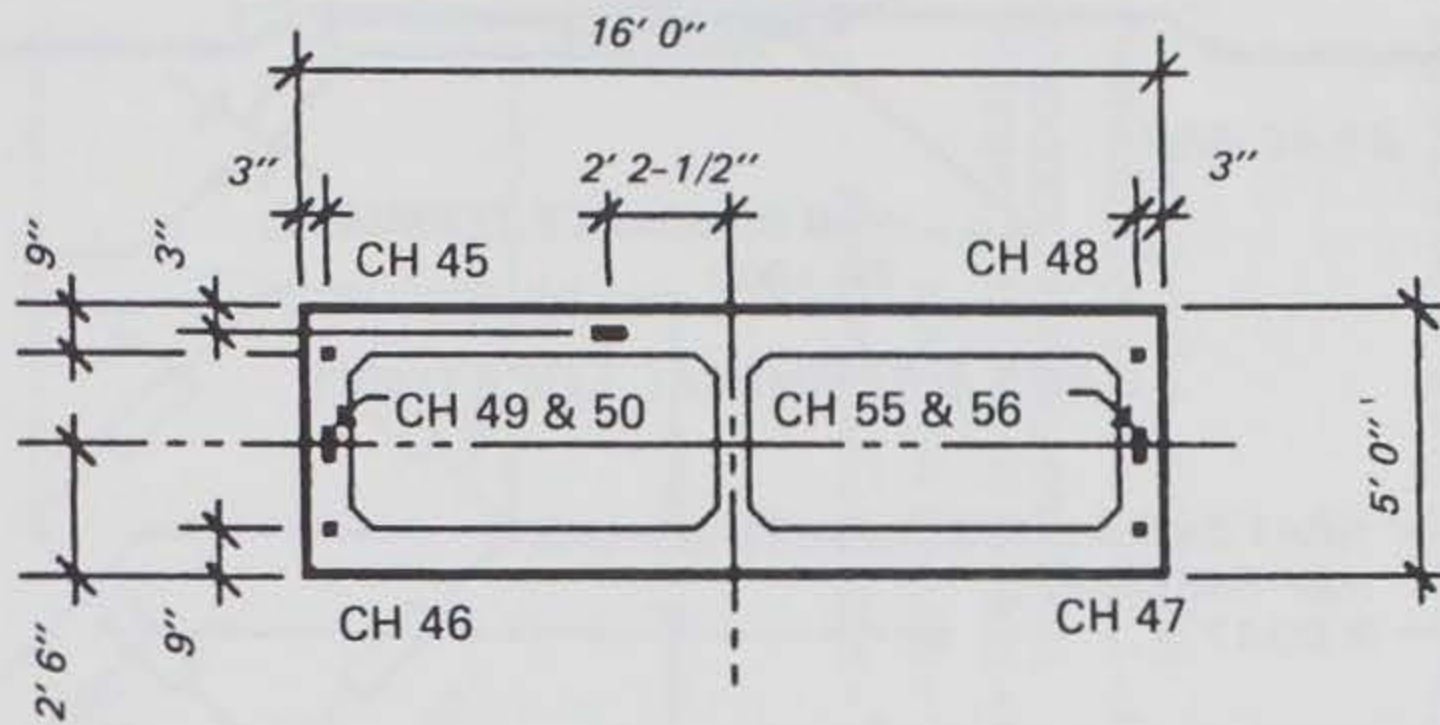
Concrete Strain Gage Layout, Section A-A
